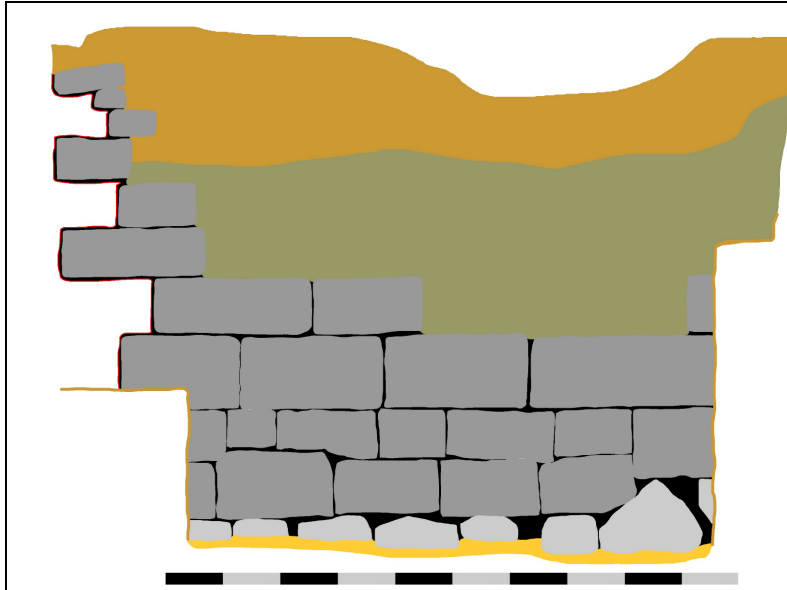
Elevation drawing of the ha ha wall in trench 2. The scale is 2m. Stones in light grey are the horizontally laid foundation stones. The orange at the base is the natural gravels, the brown at the top is modern topsoil, while beneath it in grey/green is the rubble backfill behind the wall.
